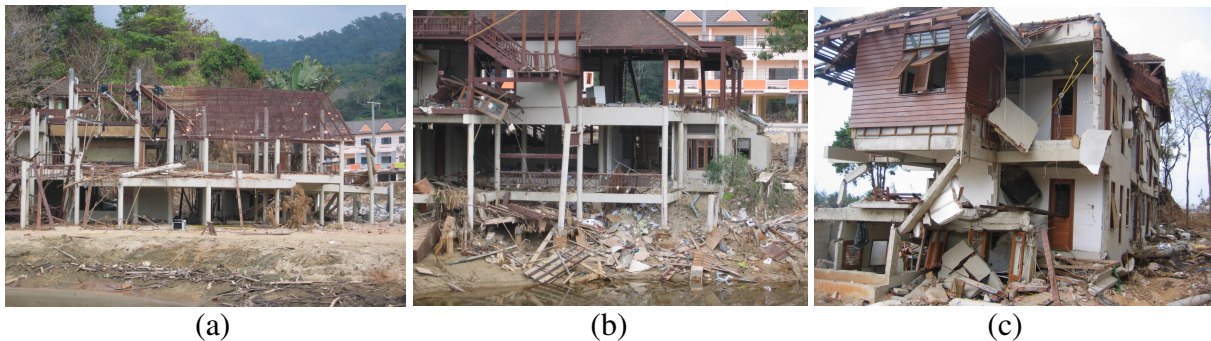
Structural damage in Nai Thon Beach, Thailand, due to tsunami waves
